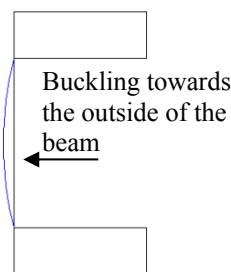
Web Buckling towards the Outside of the Beam, between Two Rivets, as found in 201x62x19x1.1x1.9 RHFCB with 100 mm Rivet Spacing
